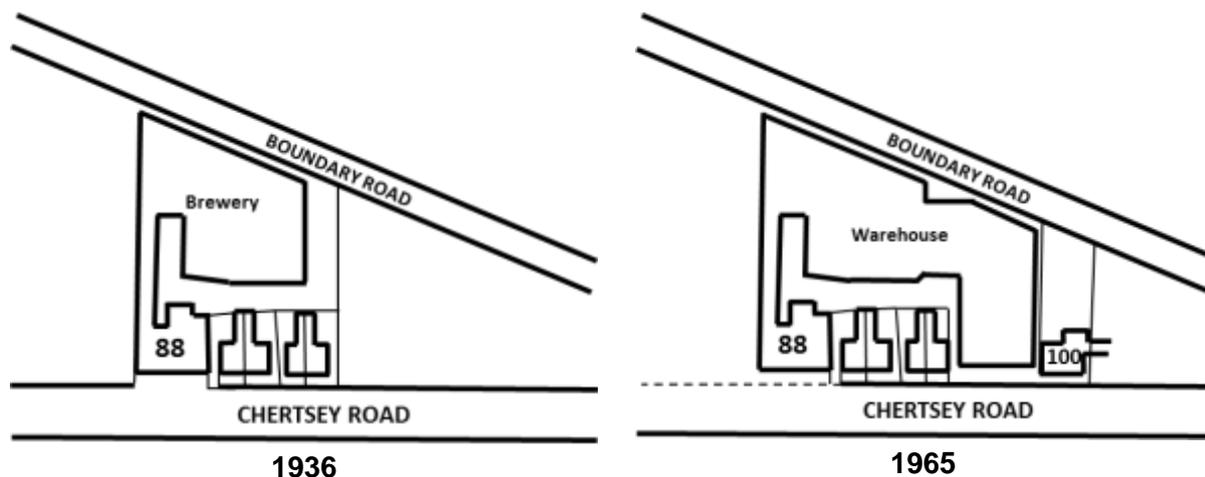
Plans of 88 Chertsey Road 1936 & 1965
